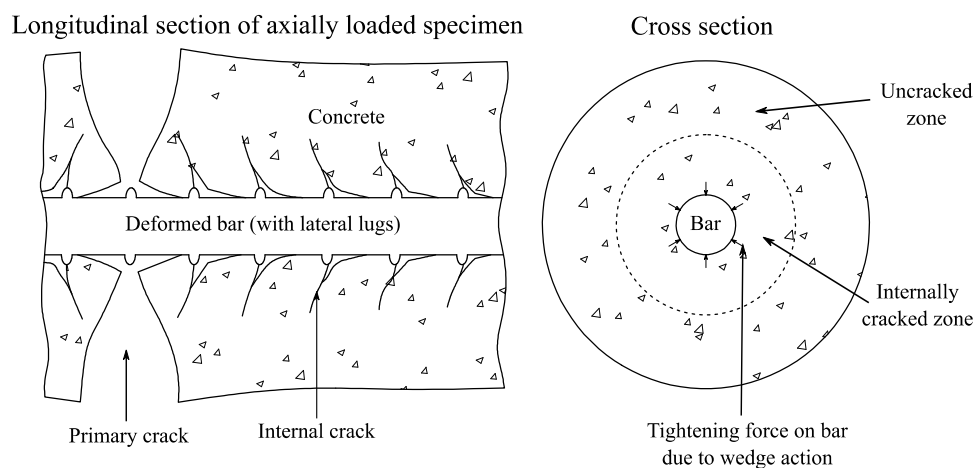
Internal cracks around the reinforcing bar embedded in concrete (Goto 1971)
